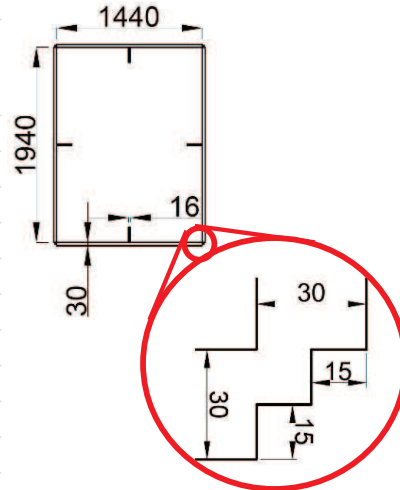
Cross section view of a model with corrosion damage (unit: mm)
